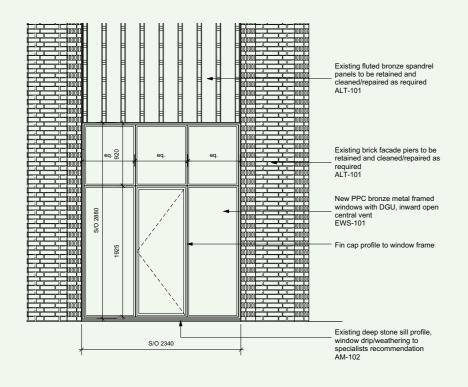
DETAIL FACADE VIEW - EAGLE WHARD ROAD, ISLINGTON (BGY)
